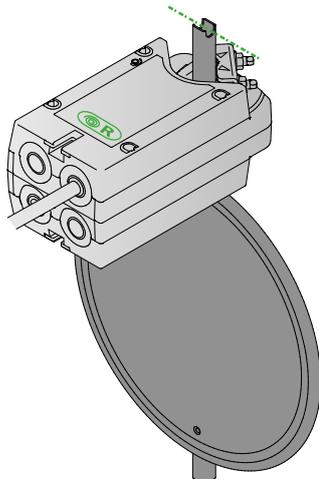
Standard installation (NC), damper closed with jumper to the right.
